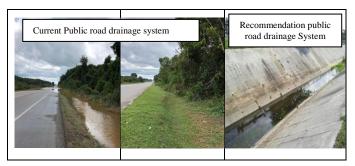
EXAMPLE OF A PUBLIC ROAD DRAINAGE SYSTEM
